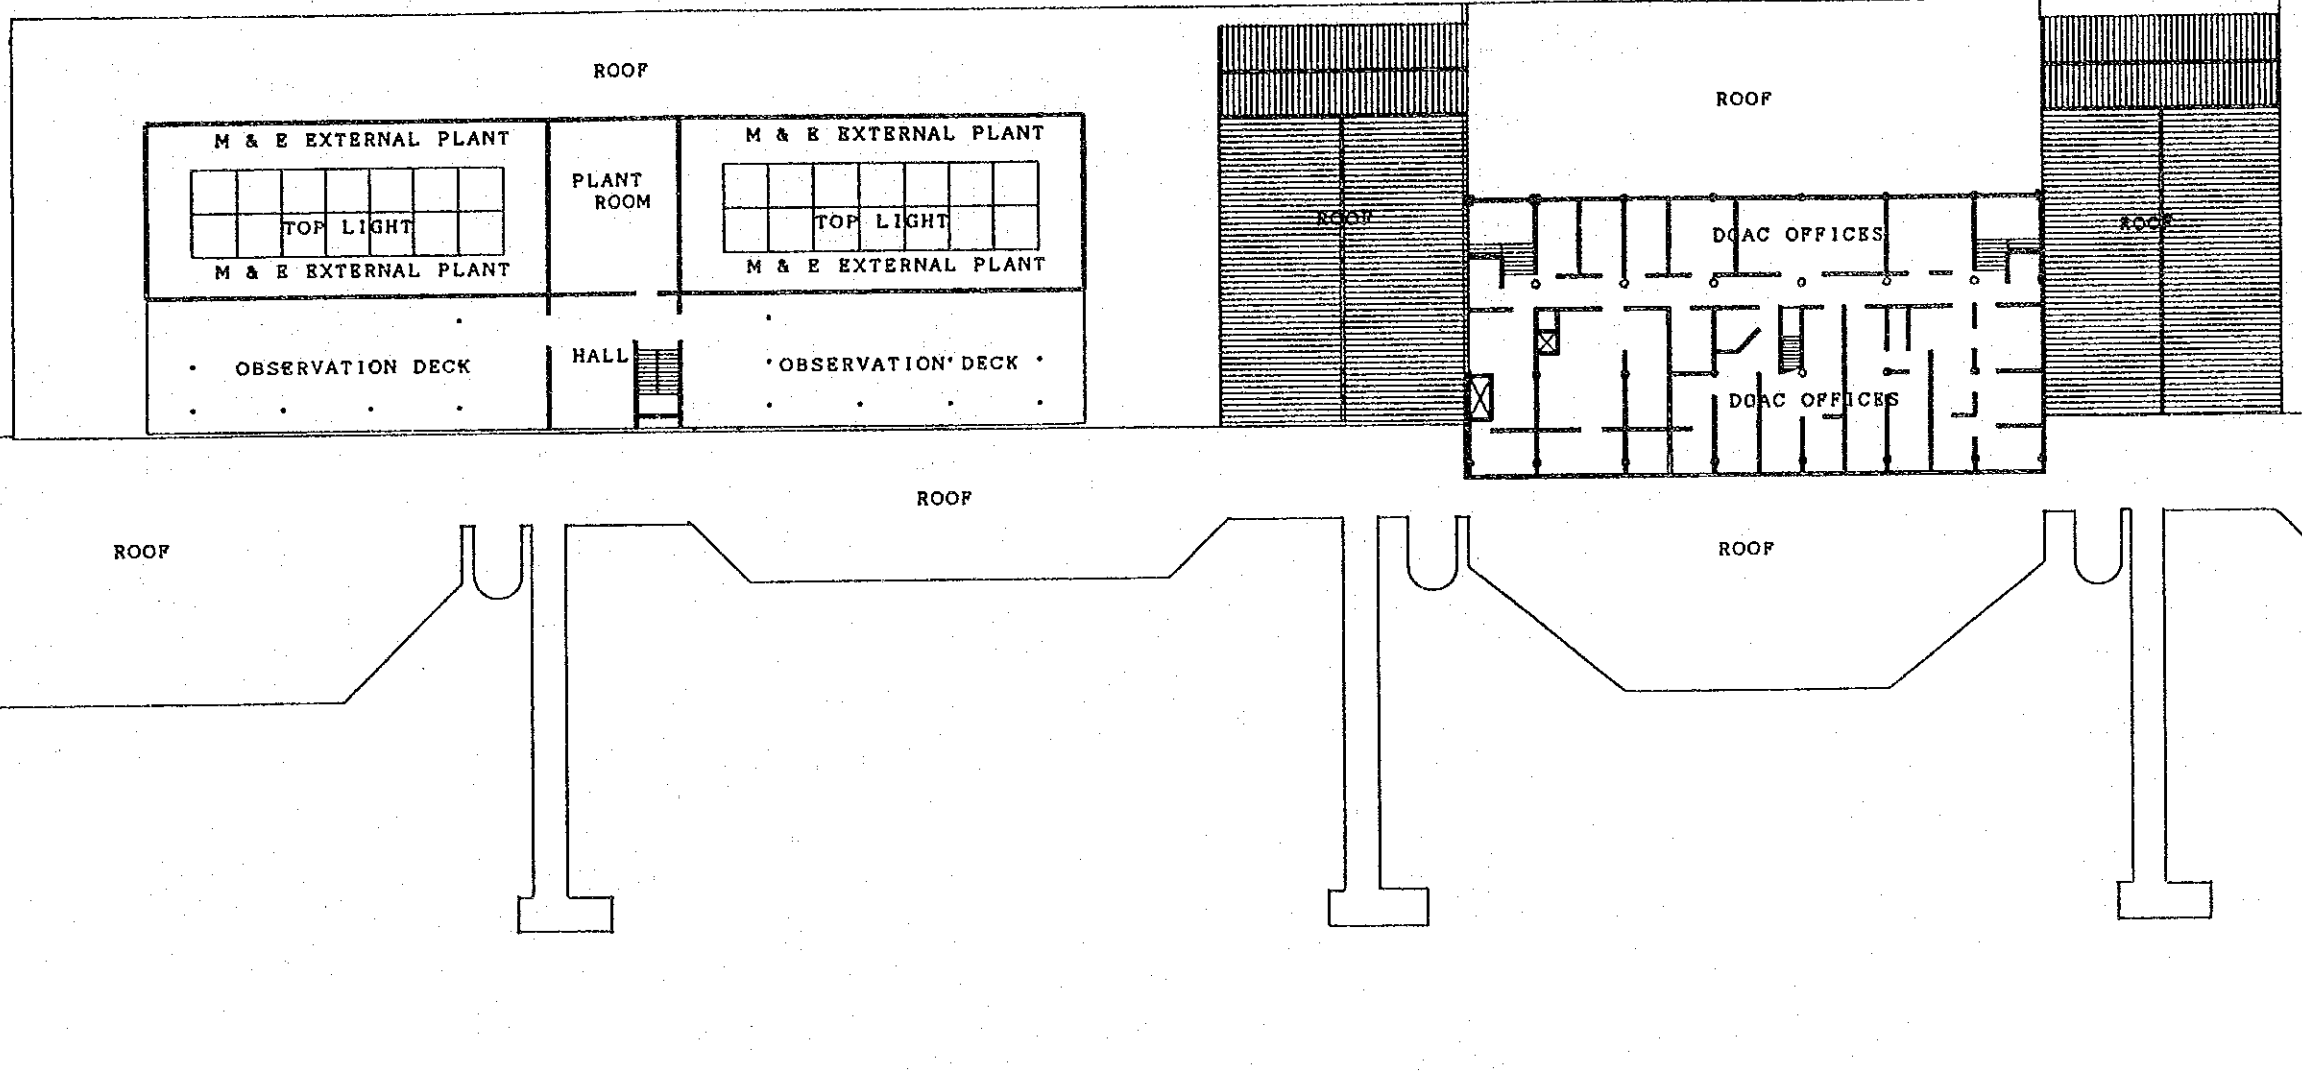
Layout Plan of International Passenger Terminal Building (2nd Floor)
